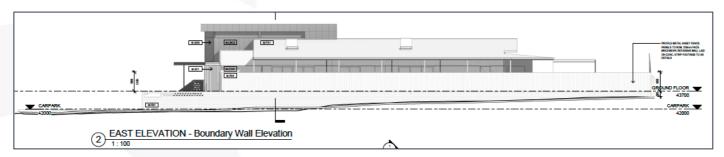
Cessnock Road elevation (Source: Architectural plans)
